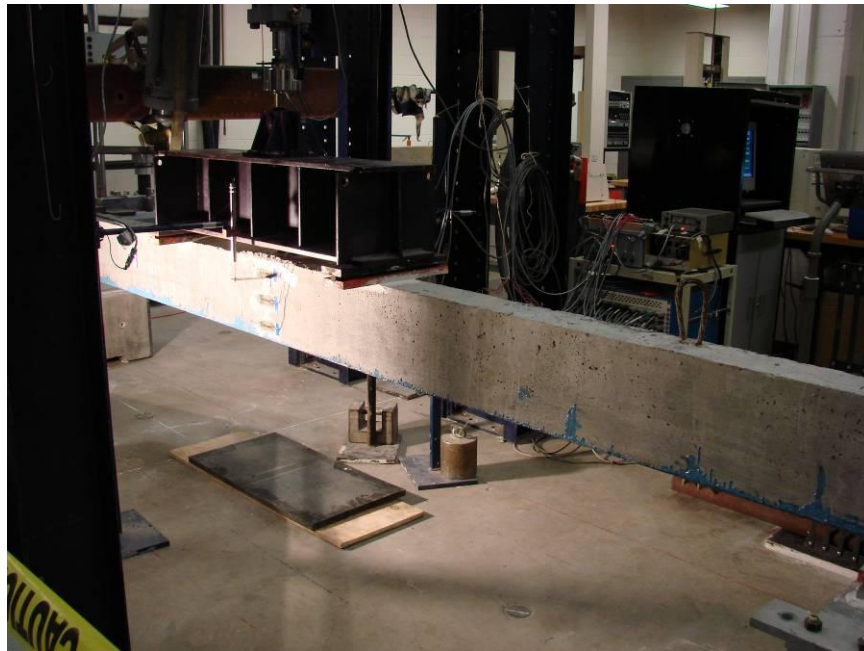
Beam R2 After Testing Showing Separation Failure of CFRP
